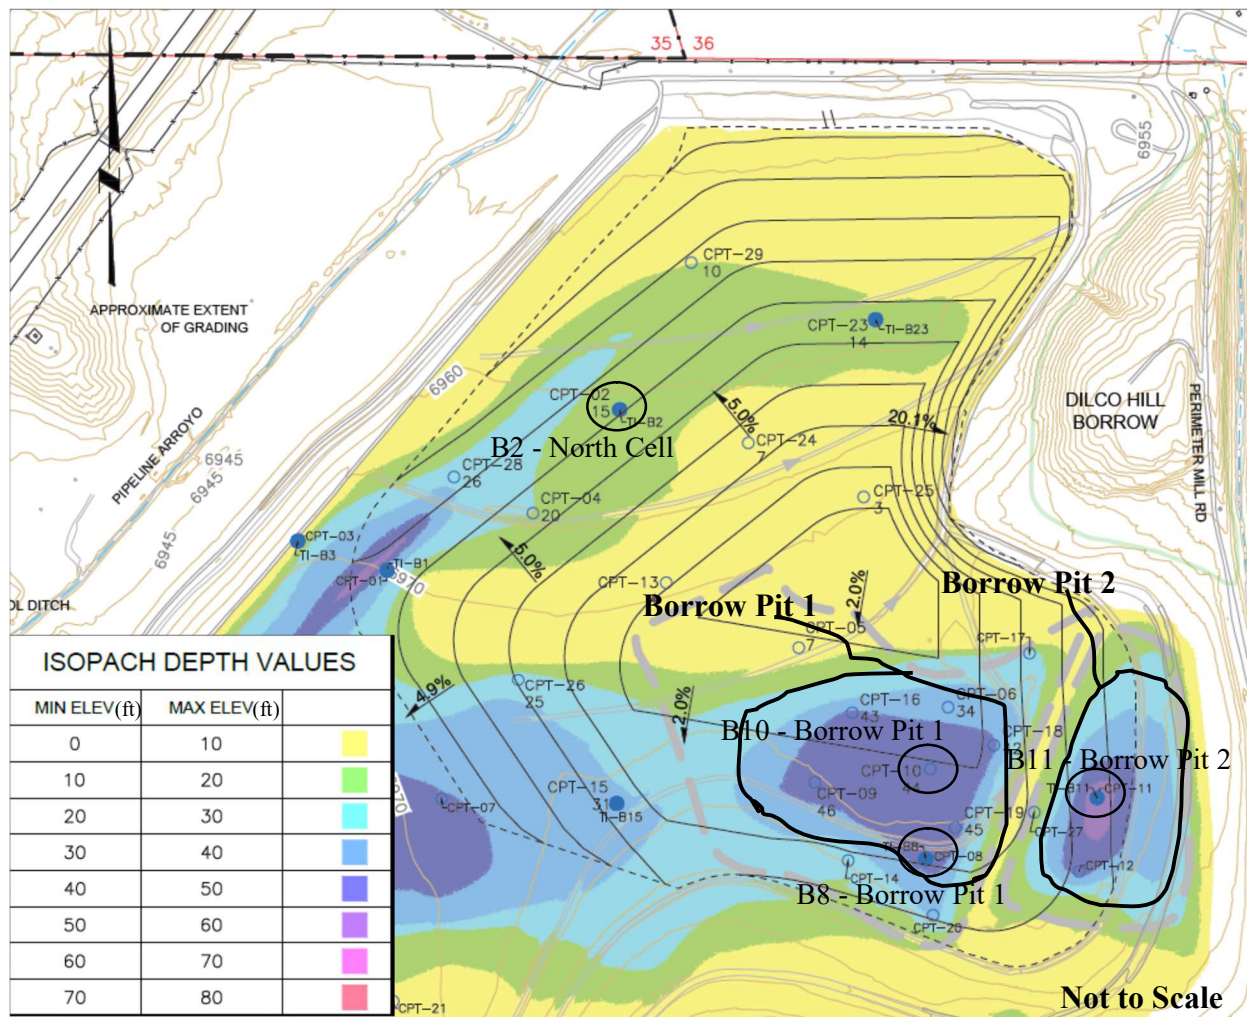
Existing Ground Surface and Tailings Thickness with Boring Locations and Repository Plan
